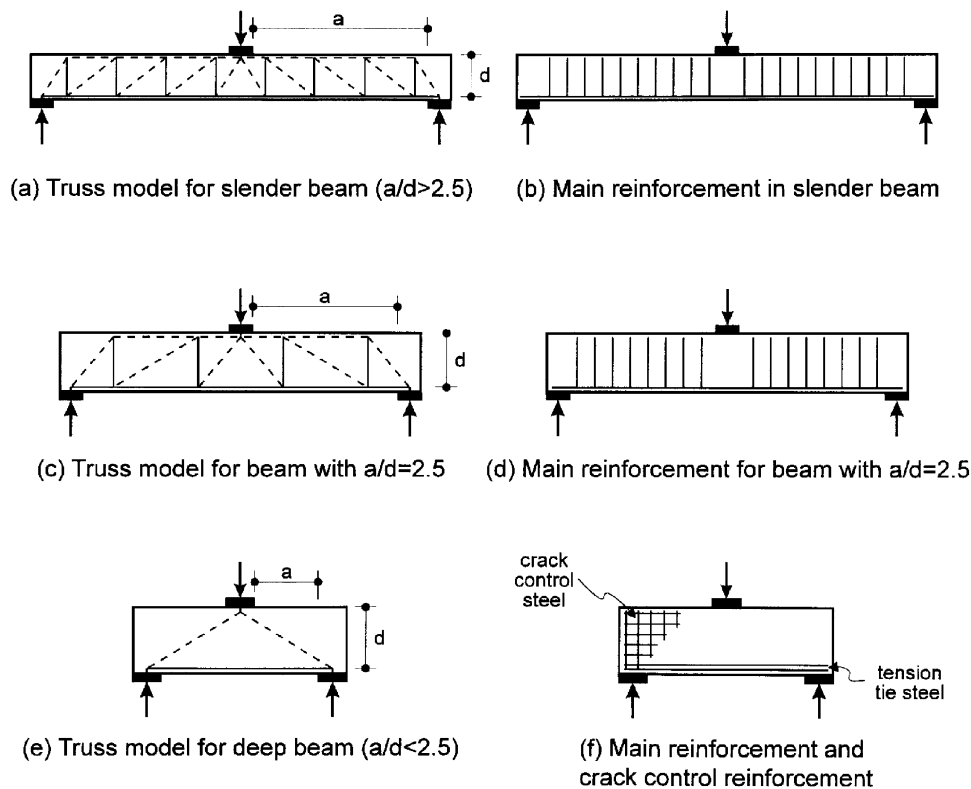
Truss models showing transition from slender beams to deep beams.
